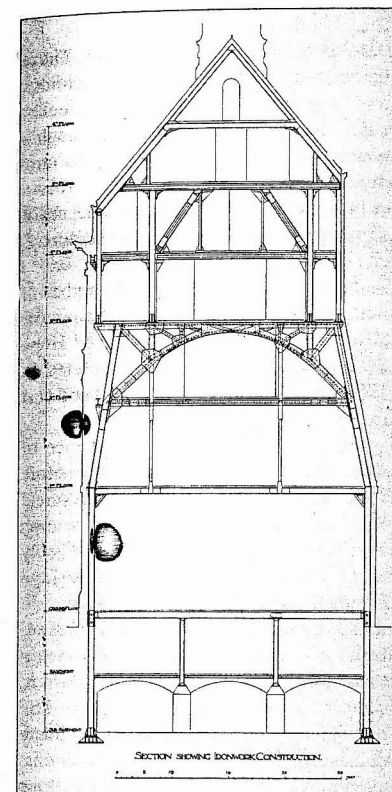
The Royal Insurance Building, Liverpool. Cross-section of the building showing structural steel frame (J.N. Hetherington, *The Royal Insurance Company's Building, Liverpool*, 1904, courtesy of Andrew Saint)
